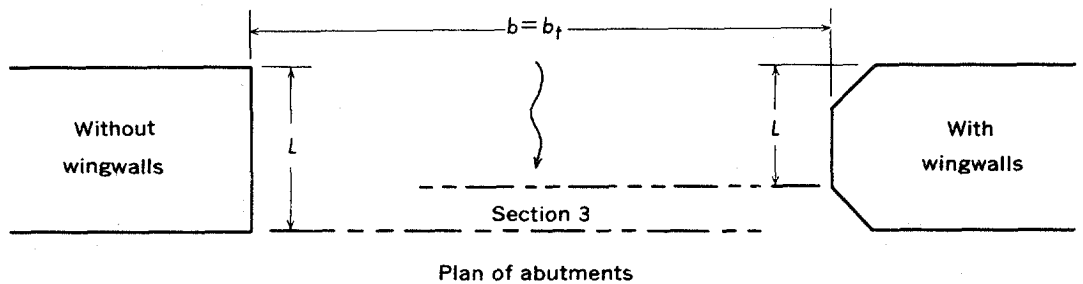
Definition sketch of type 1 opening, vertical embankments and vertical abutments, with or without wingwalls (after Matthai).
